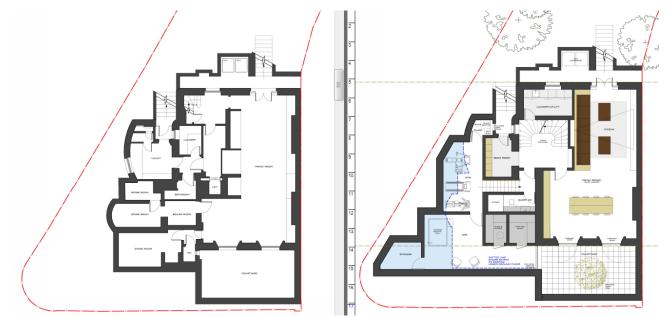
(above): Existing lower ground floor (left) and proposed lower ground floor (right)
